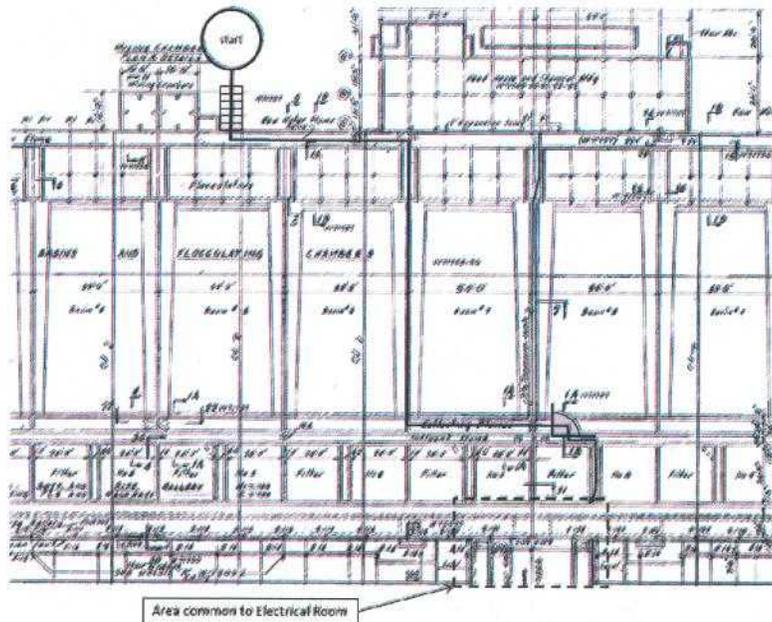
183-D Walk Down Path to Filter Building, and Pump Room and Electrical Switchgear
